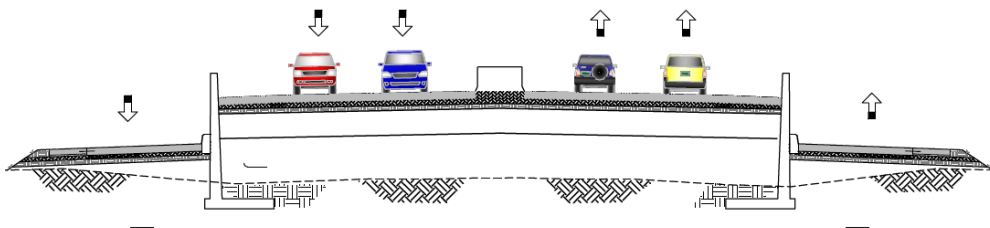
Typical Cross Section for Embankment w/ Side Road/Service Road
